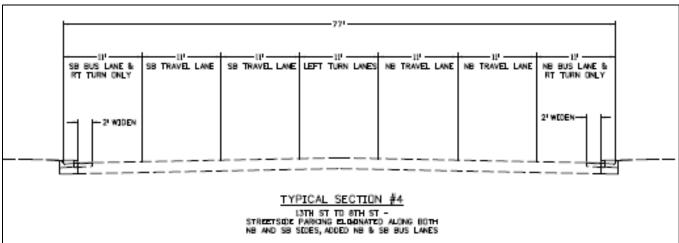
GRAND AVENUE TYPICAL SECTIONS
